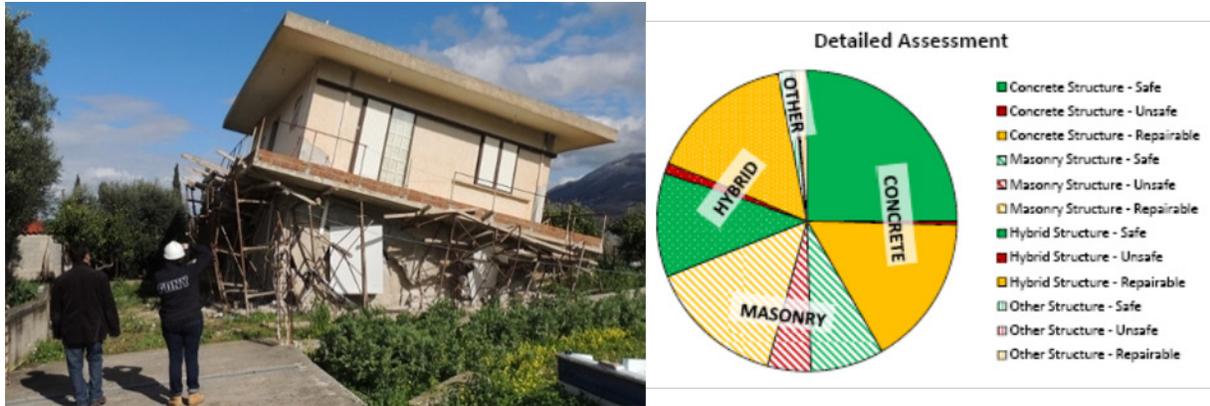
Mixed construction collapse (left); detailed assessment of 2,770 buildings (right).
